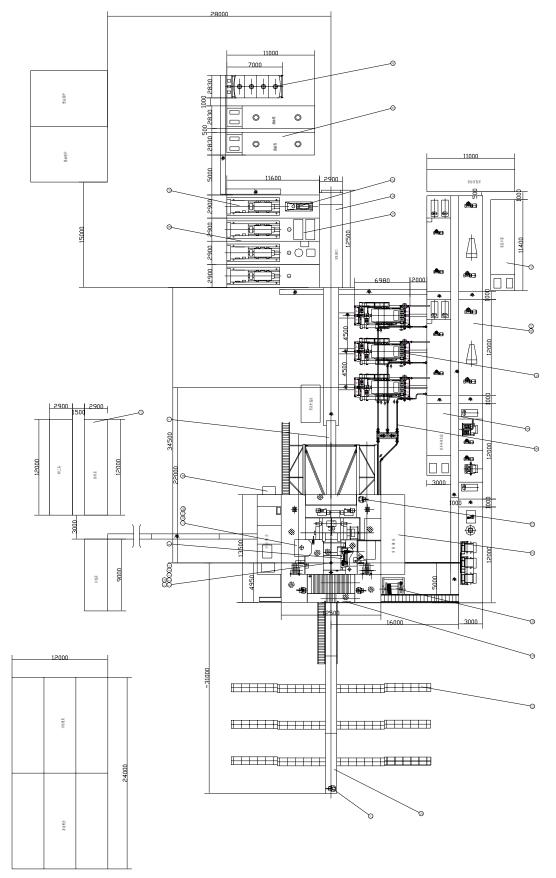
elevation drawing for ZJ70D drilling rig
